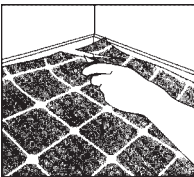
Inside Corners: Diagonal cutoffs are made at inside corners until the material falls into place in the corner angles.
